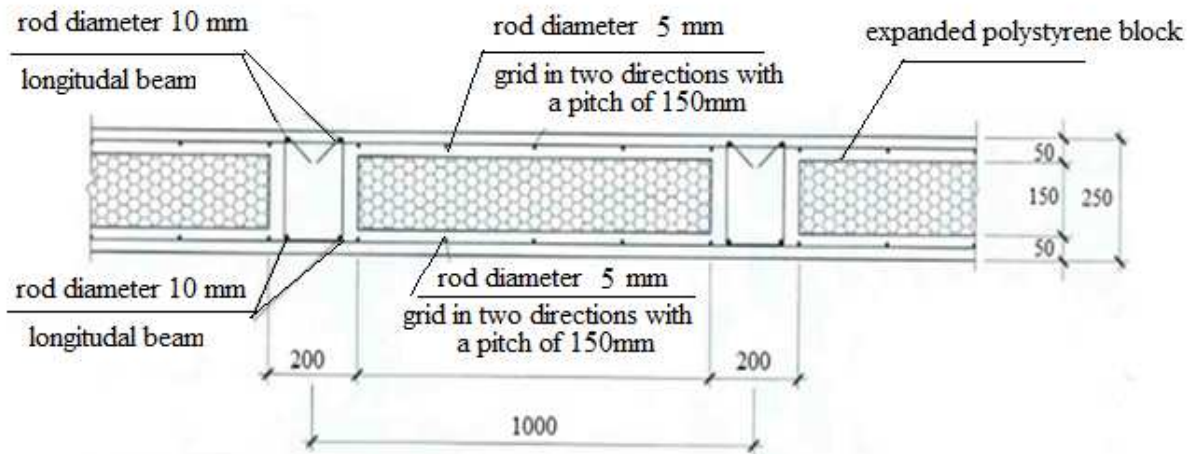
Cross-section of reinforced concrete floor of a skyscraper
